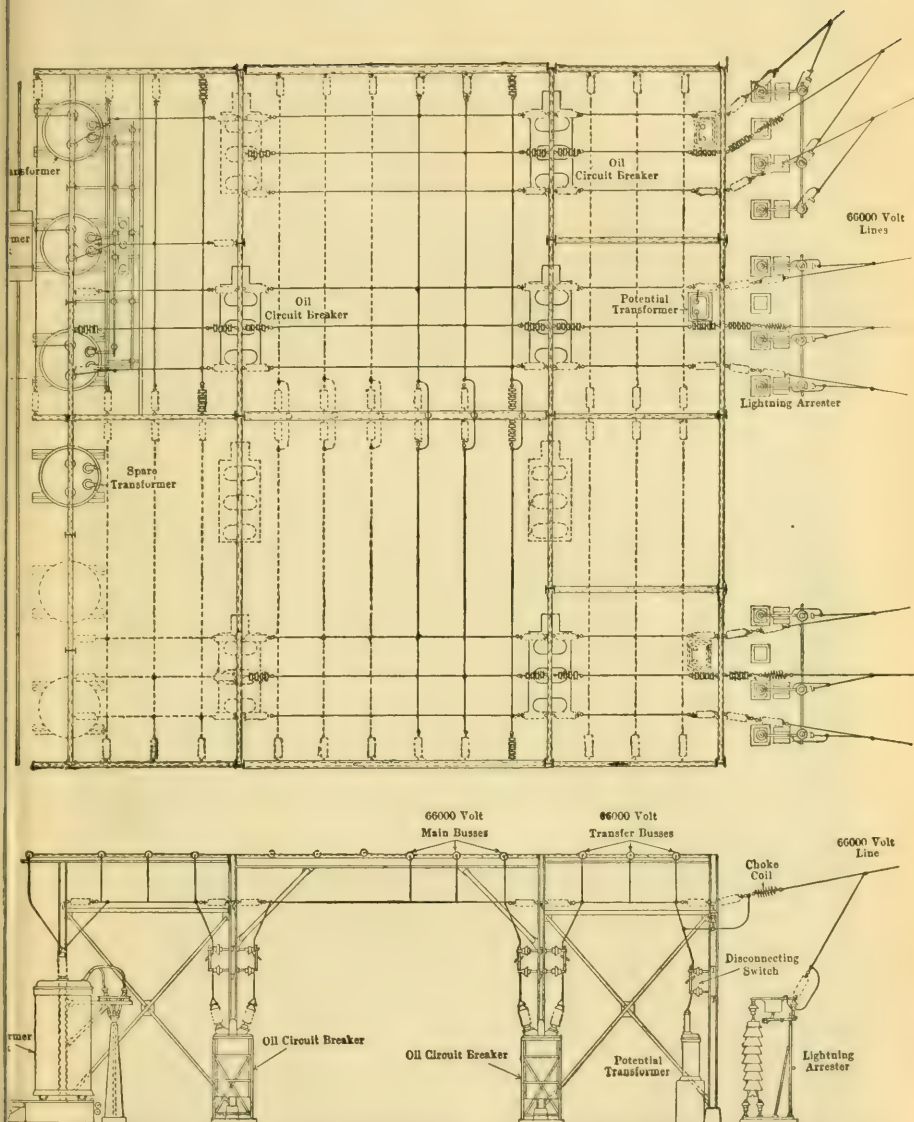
Typical 66,000 Volt Outdoor Transformer and Switching Station.
